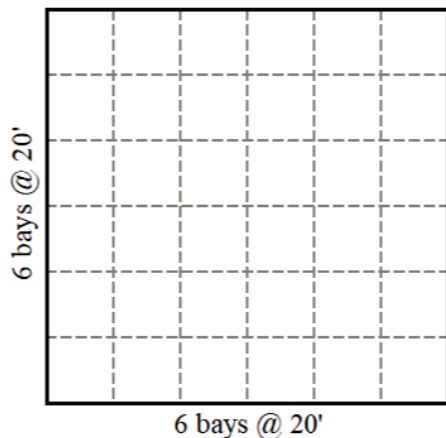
Baseline RC moment frame building typical 12-story plan.
